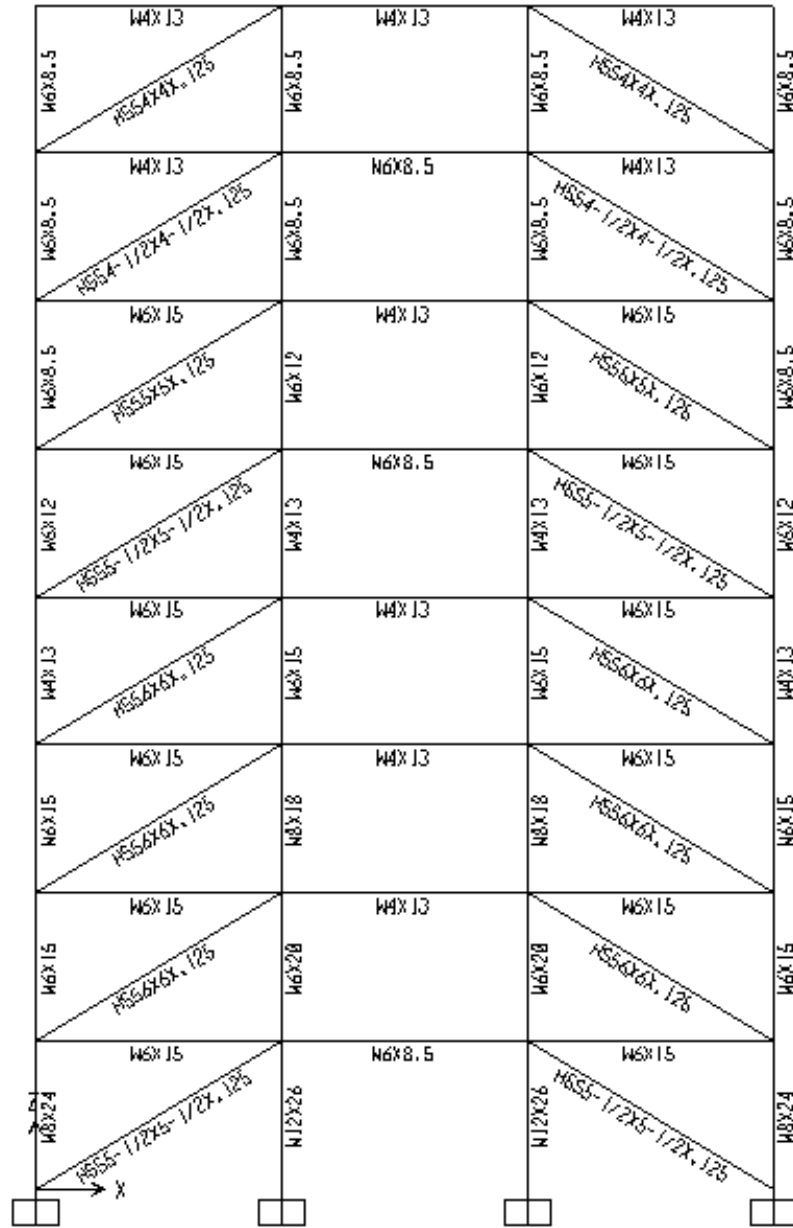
Design Sections of 8-story Diagonal braced frame.
